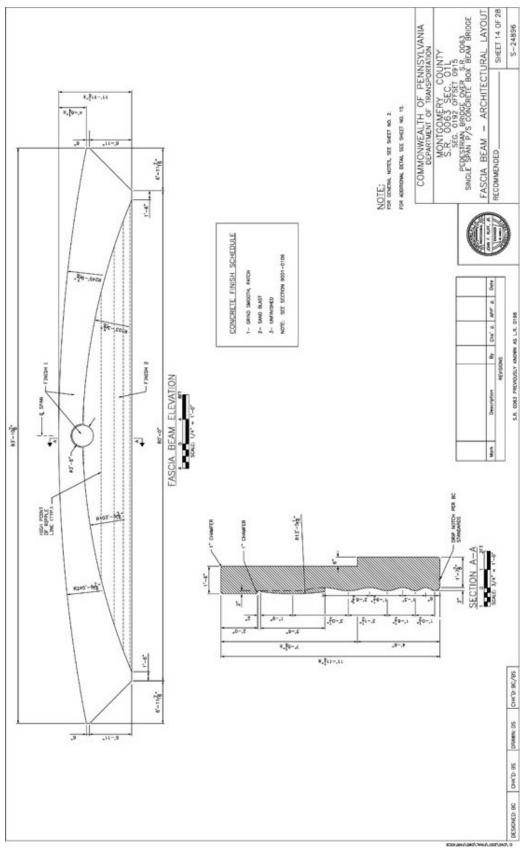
Landscape architect's construction document for fascia beam architectural treatment.
